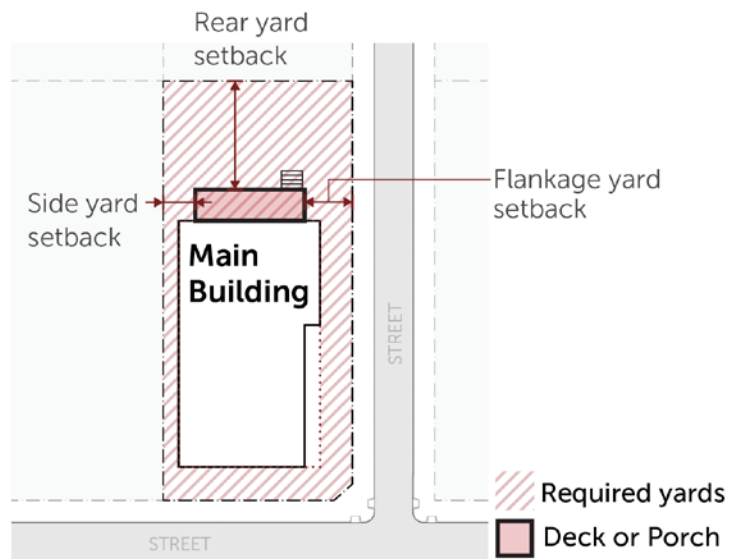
Section 3.15 – Example of Provisions for Decks and Porches
